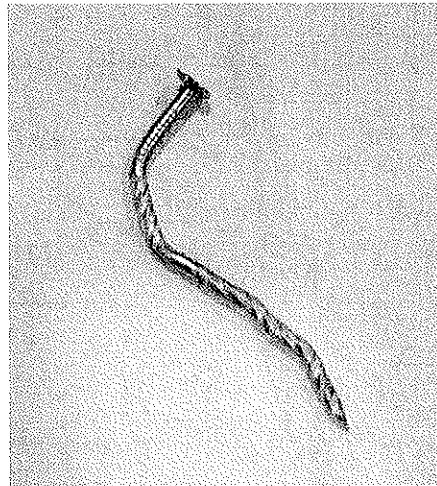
Typical nail failure mode exhibited in walls 704 to 706 with 25.4 mm thick plywood.
